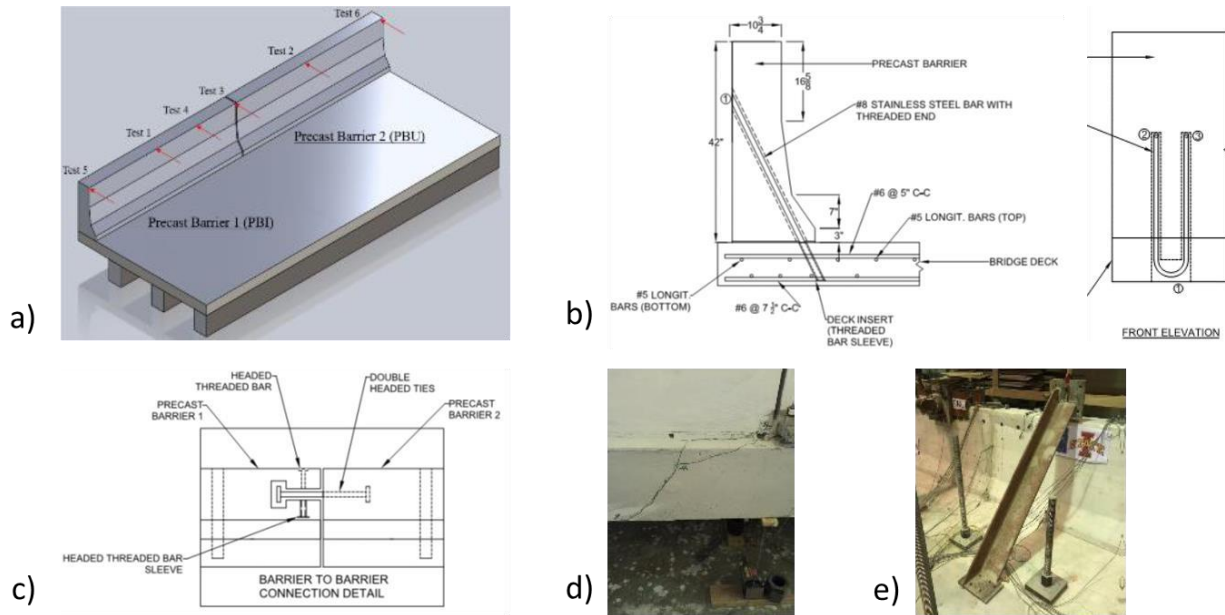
Research on Precast Concrete Bridge Barriers at ISU: a) Test setup for full-scale specimen, b) Details of the barrier-to-deck connections, c) detail of the barrier-to-barrier connection, d) widest crack in the deck at the end of Test 1, and e) Bracing beam used to prevent deflection of PBU barrier during Tests 4-6 [8].
